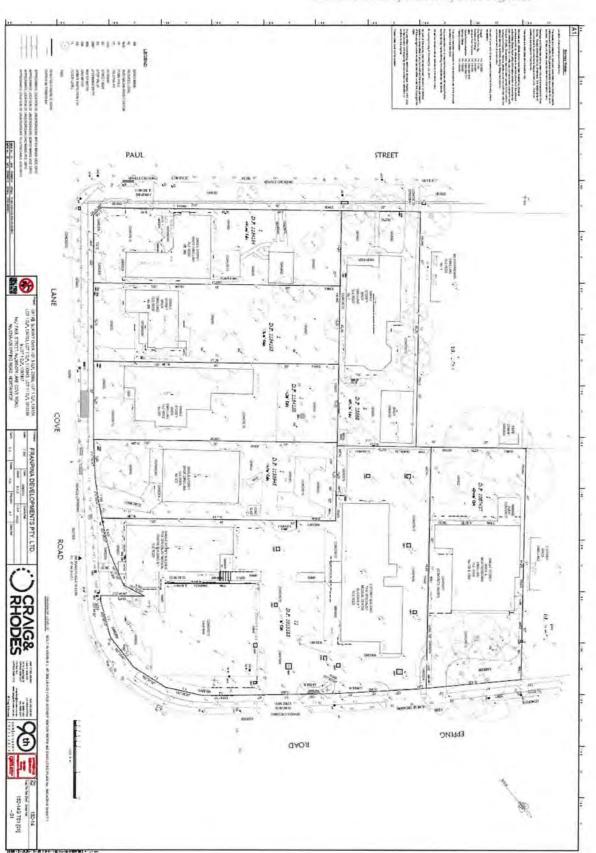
Existing Survey Plan (Craig & Rhodes)
